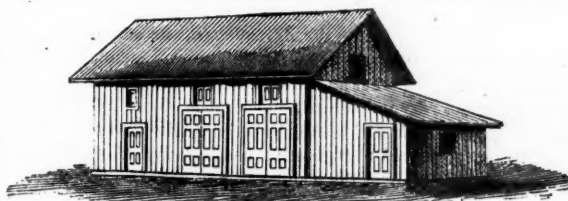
CARRIAGE HOUSE, STABLE AND WORKSHOP—ELEVATION.
